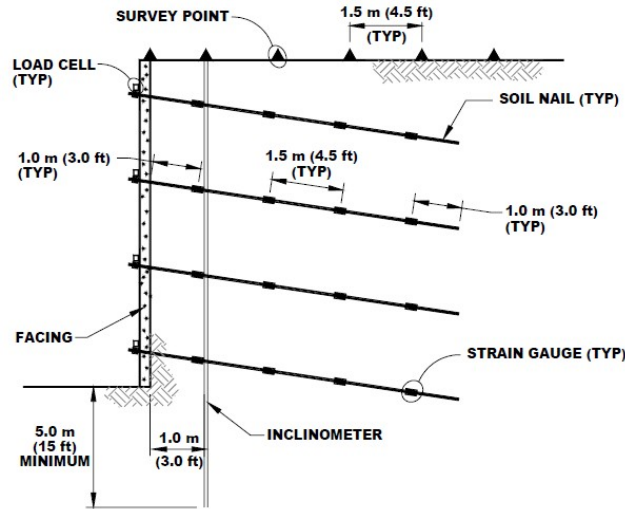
Typical Soil Nail Wall Instrumentation (after FHWA, 2003).
